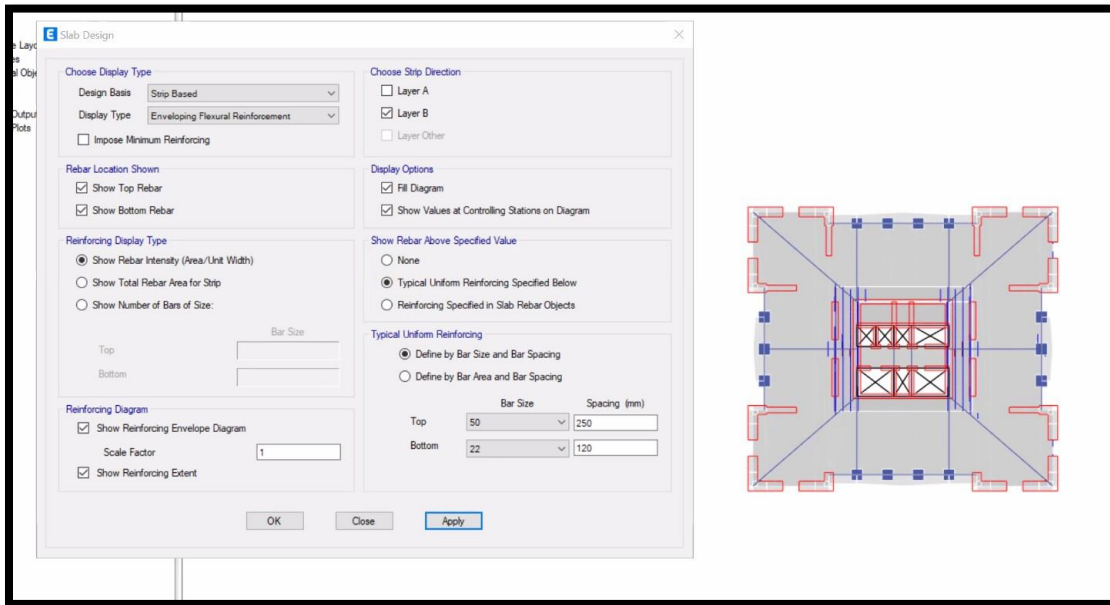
Bottom Reinforcement in Y-Direction for 23rd Floor
